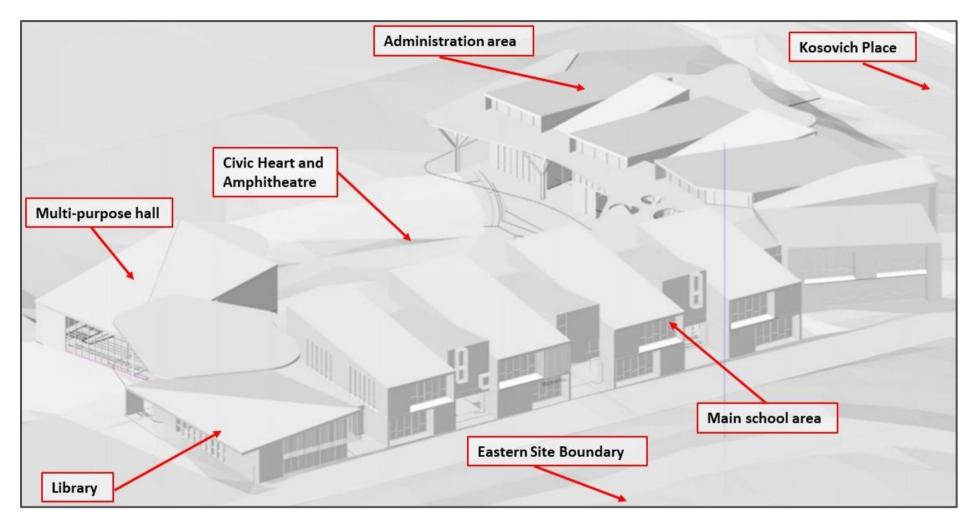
| Building massing, view from south east of site (Source: Applicant's EIS 2018)
